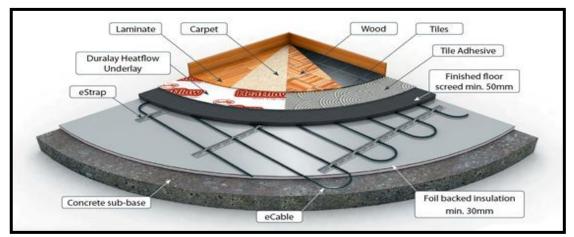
Laminate Flooring Details (http://www.heatandplumb.com/acatalog/eCable\_Electric\_Underfloor\_Heating.html)
